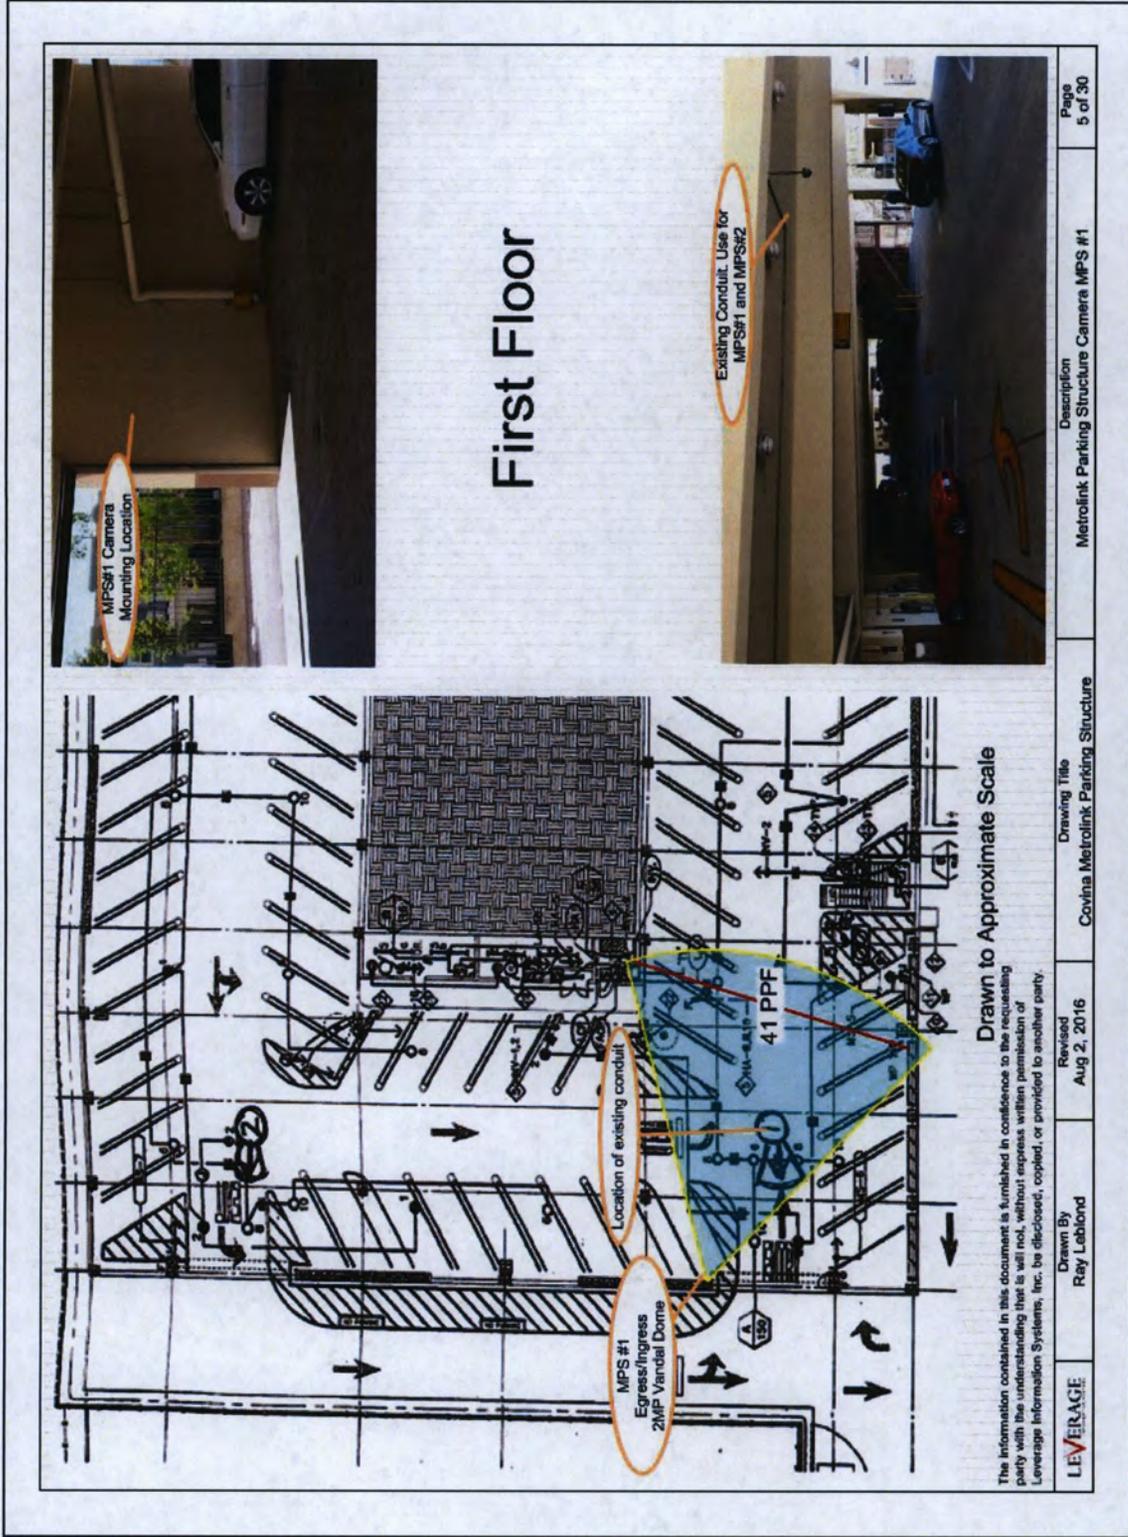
Metrolink Parking Structure – 1<sup>st</sup> Floor Conduit Plan
